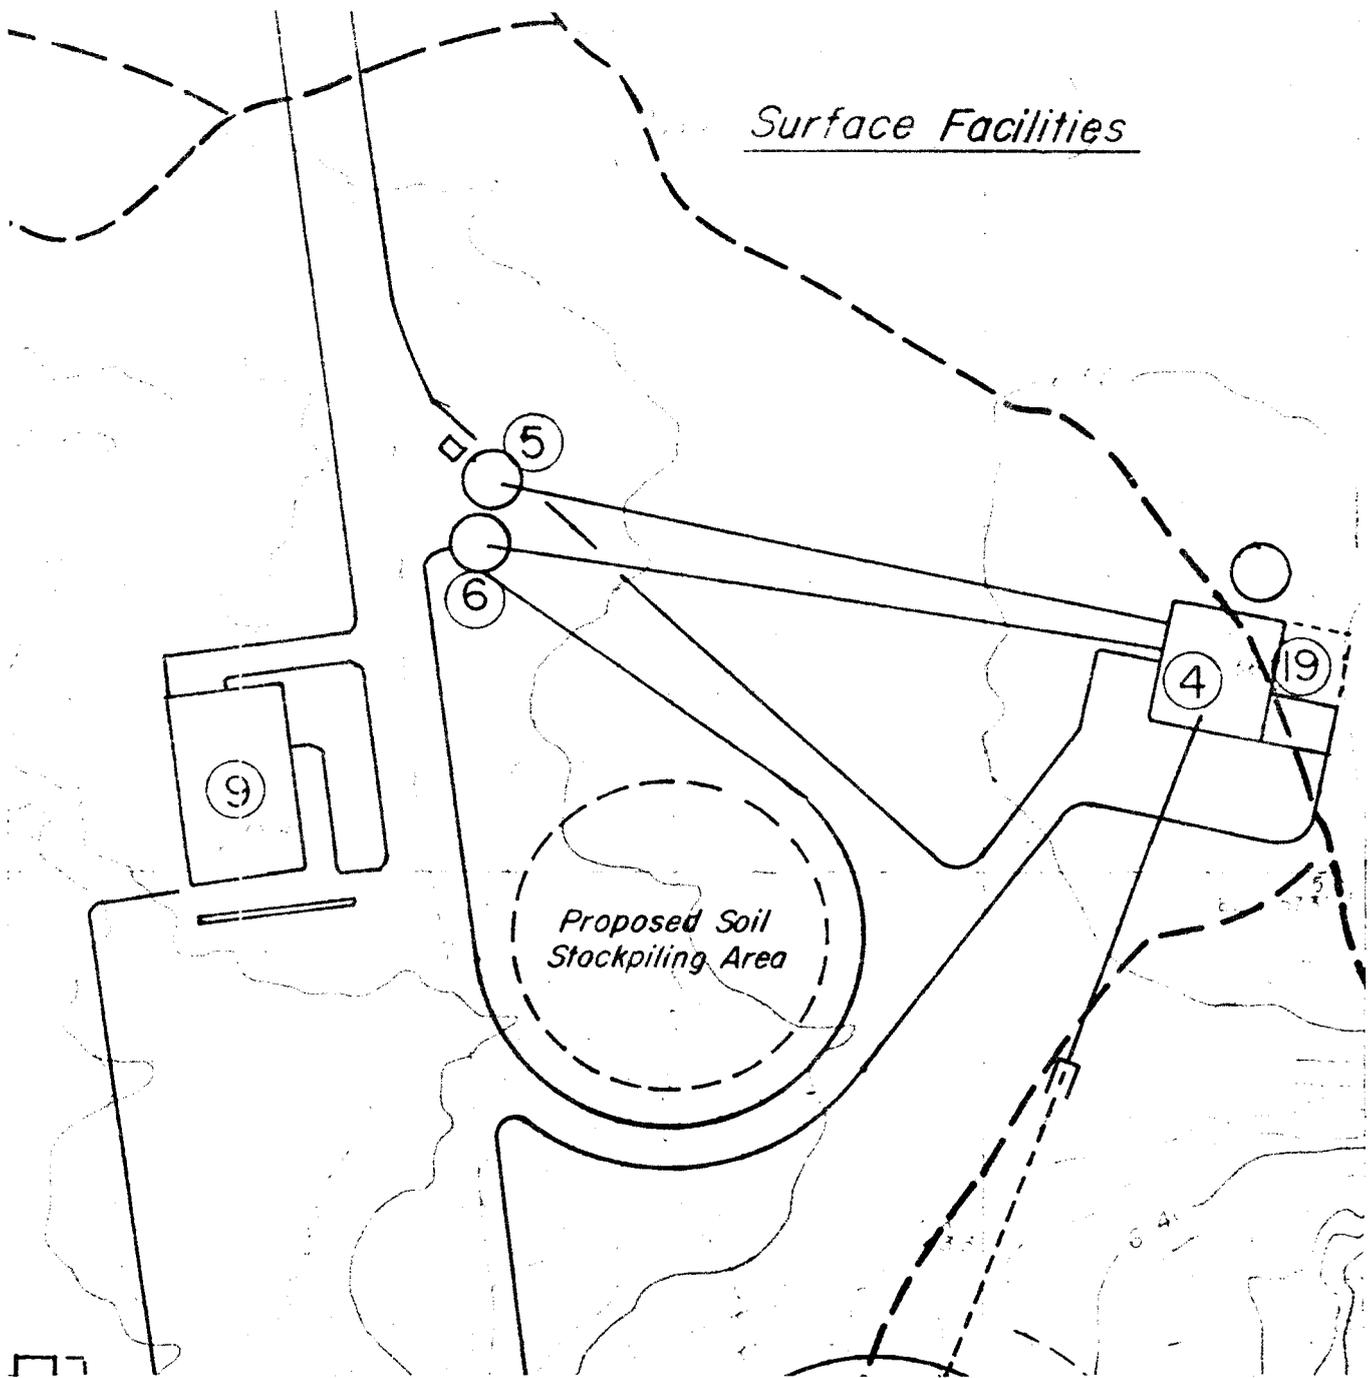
Proposed surface facility soil stockpiling area. Revision of Appendix B of the Mining and Reclamation Plan.
